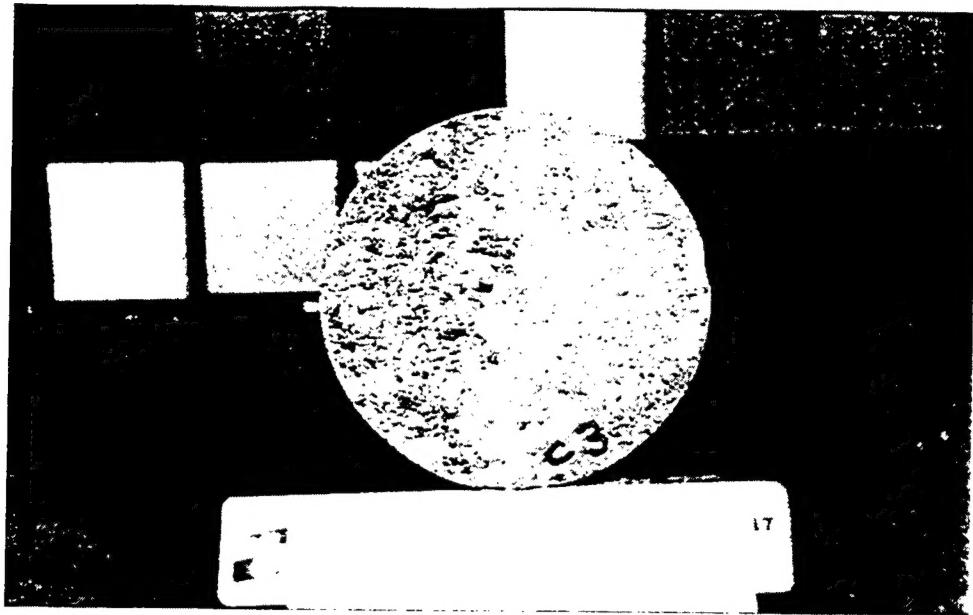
Core Sample No. 4-2C. End view of 4-in.-diam concrete bridge deck core showing roughened, spalled core top with aggregate pop-out voids in the surface
